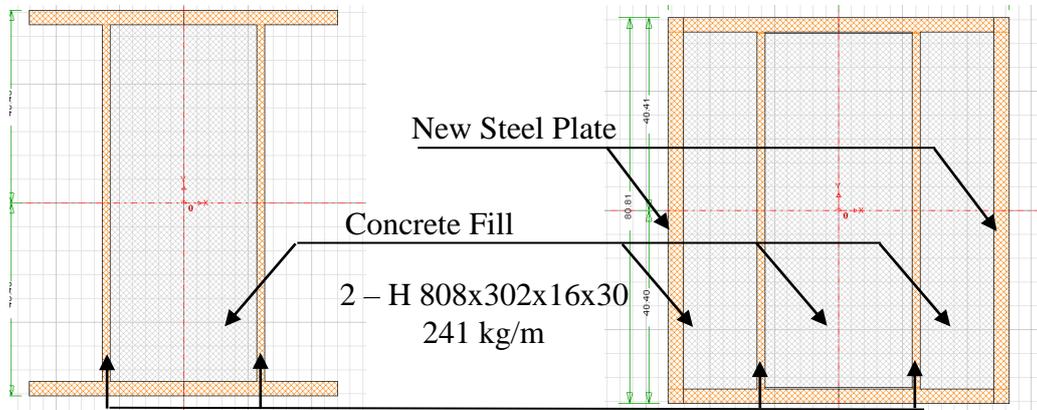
Strengthening Composite Column (a) Existing column (b) Column after strengthening
